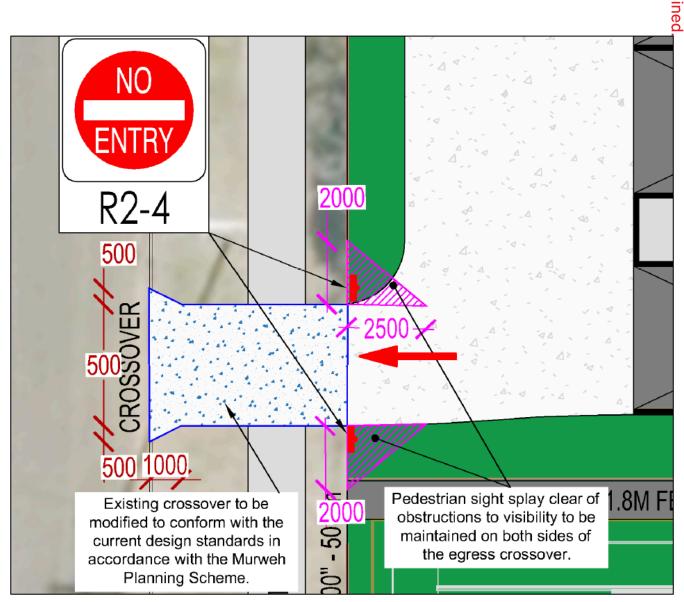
DETAIL B - Detailed Sturt Street exit crossover design
